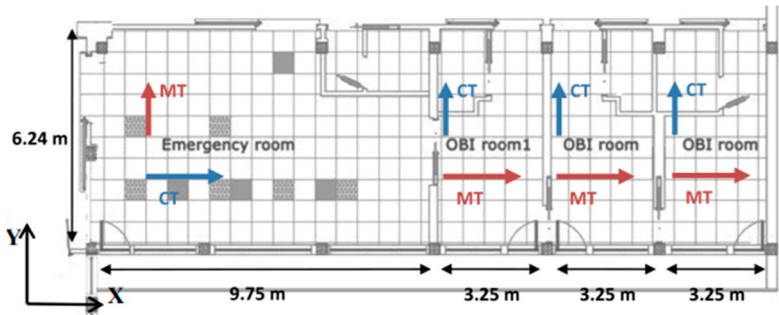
Dimensions of the rooms constituting the EMDH and direction of the suspended ceiling tees.
